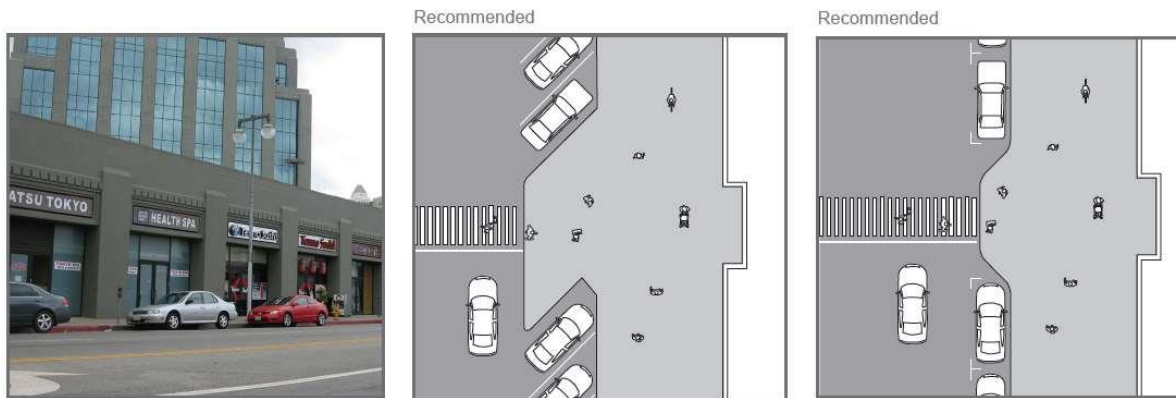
2 On-street parking and its effect on sidewalk width and street crossing.
